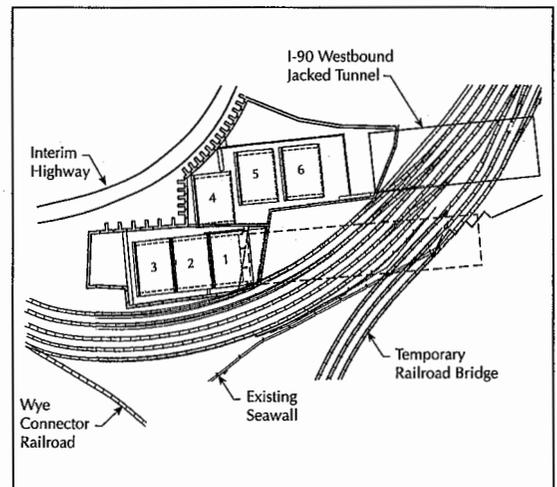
Plan locations of the thrust pits and final jacked tunnels.
